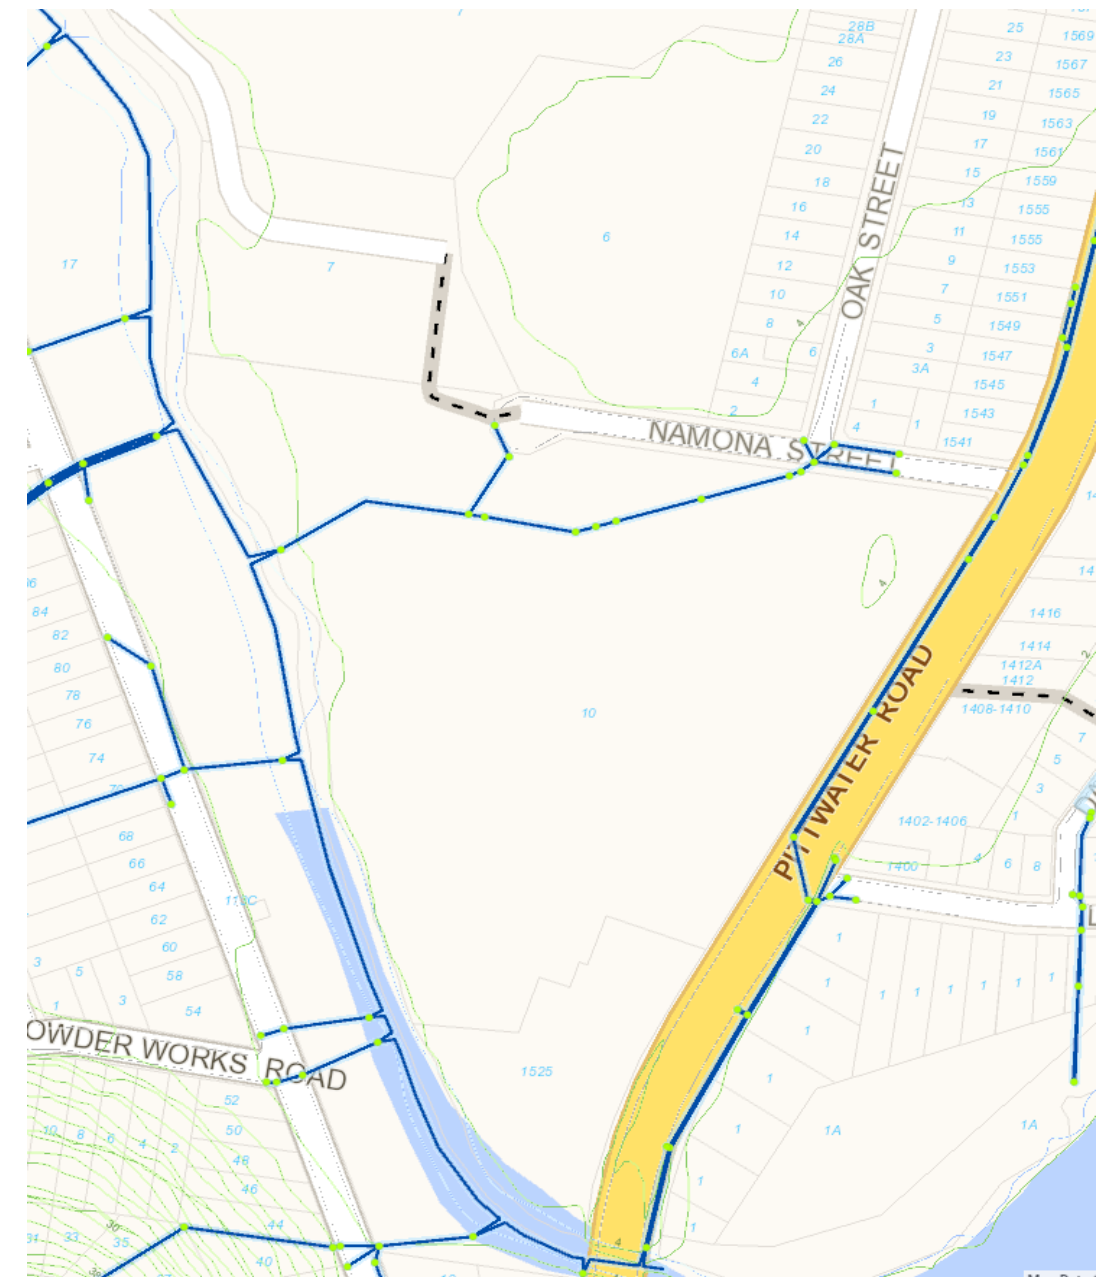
Stormwater system (Source: NBC Stormwater Map)
